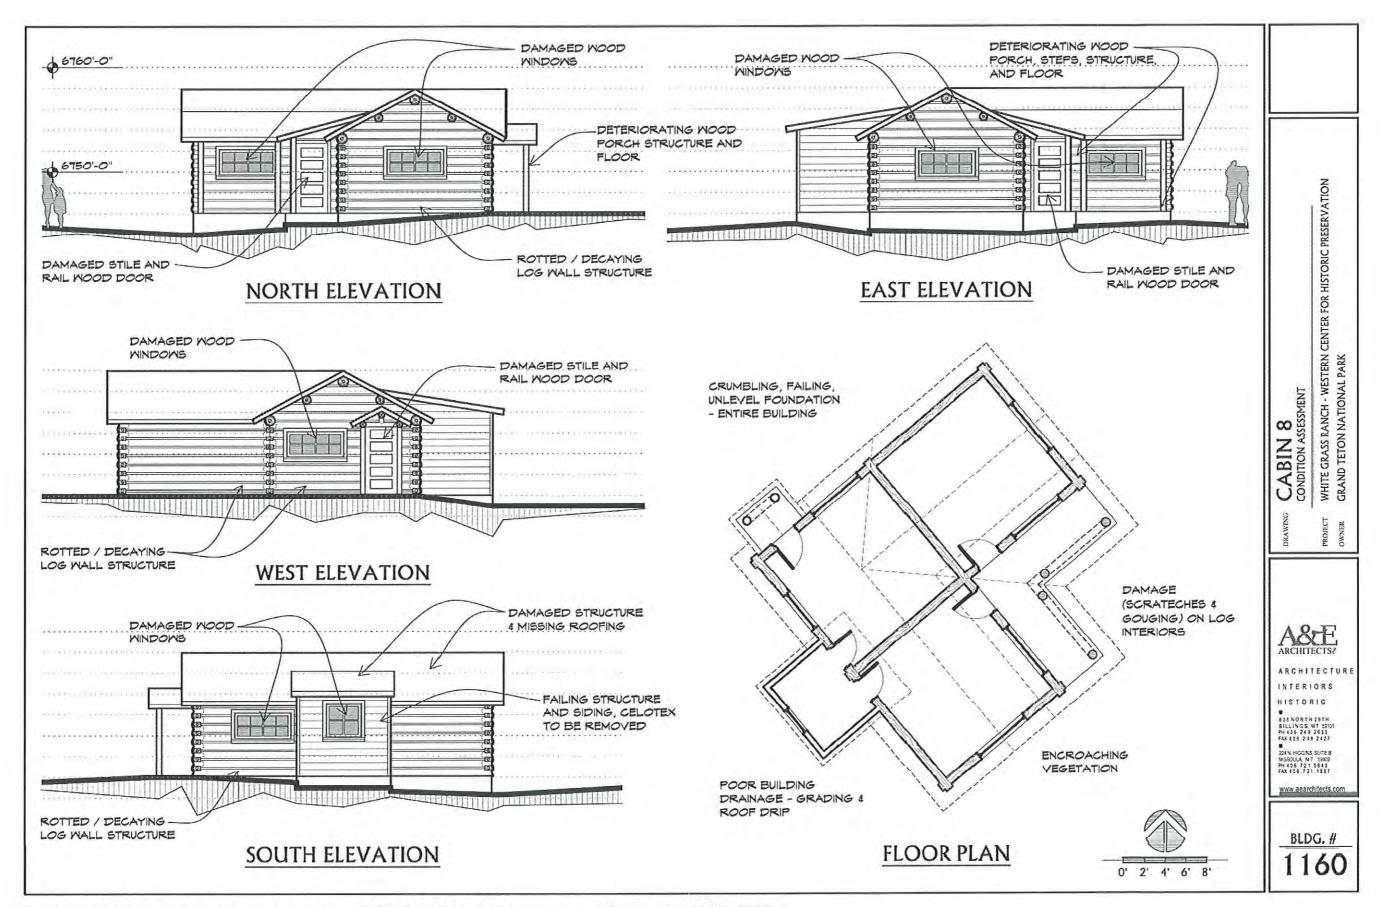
Existing conditions plan and elevations of HS-1160, Cabin 8, showing areas of deterioration (A&E: 2006).
